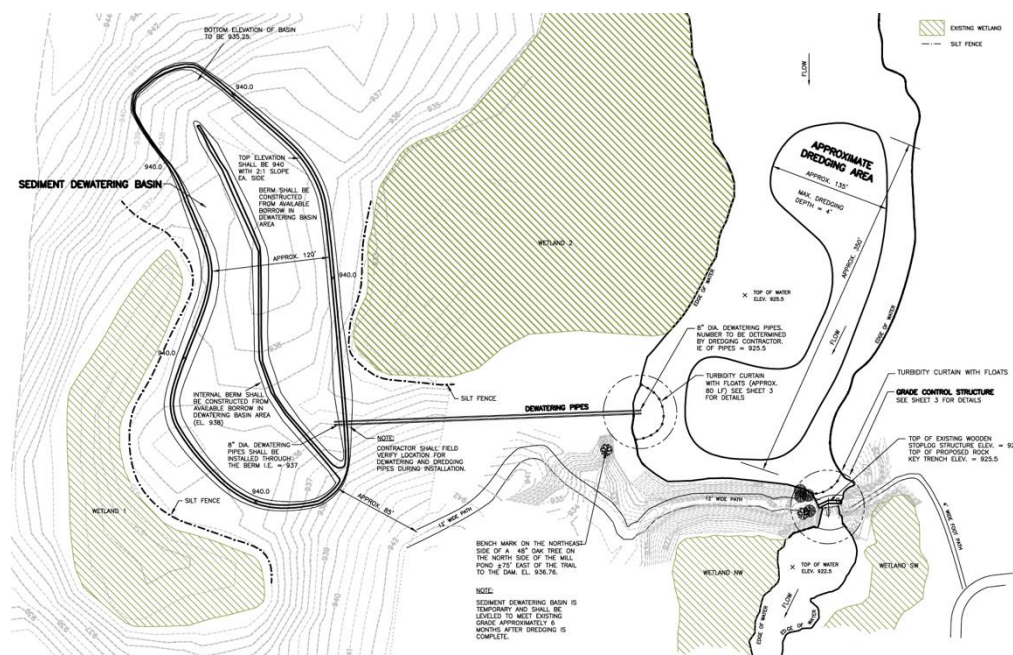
Site Plan for Petit Mill Pond sediment control project.
